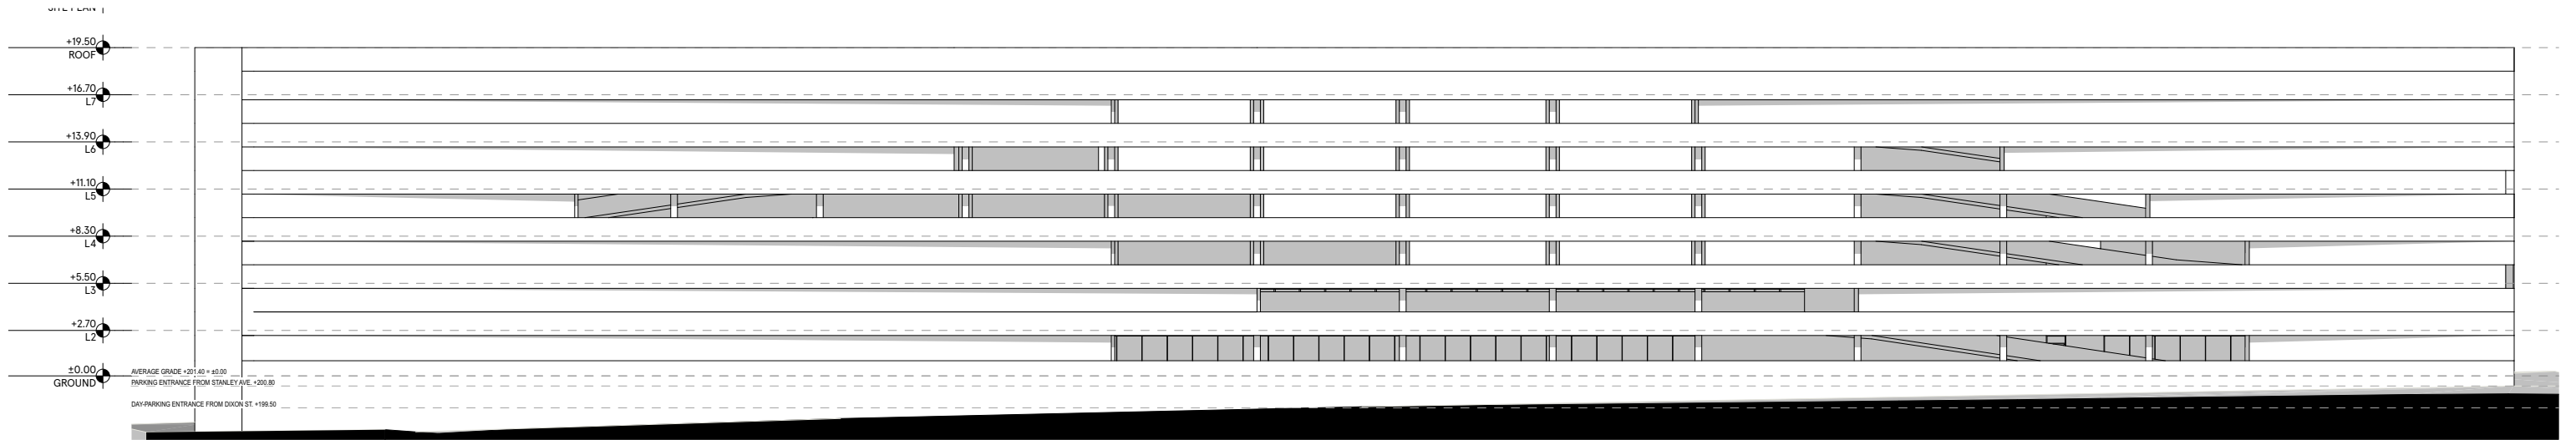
6519 Stanley Avenue South Elevations (Prepared by: Architects Alliance)
